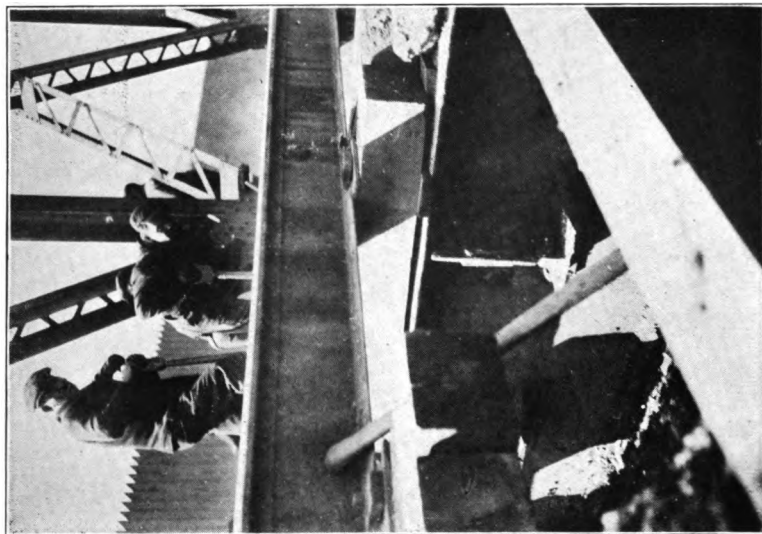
Ashland Avenue Bridge—Track supported over floor beam so that the floor beam could be cut and removed in sections without disturbing the track.
